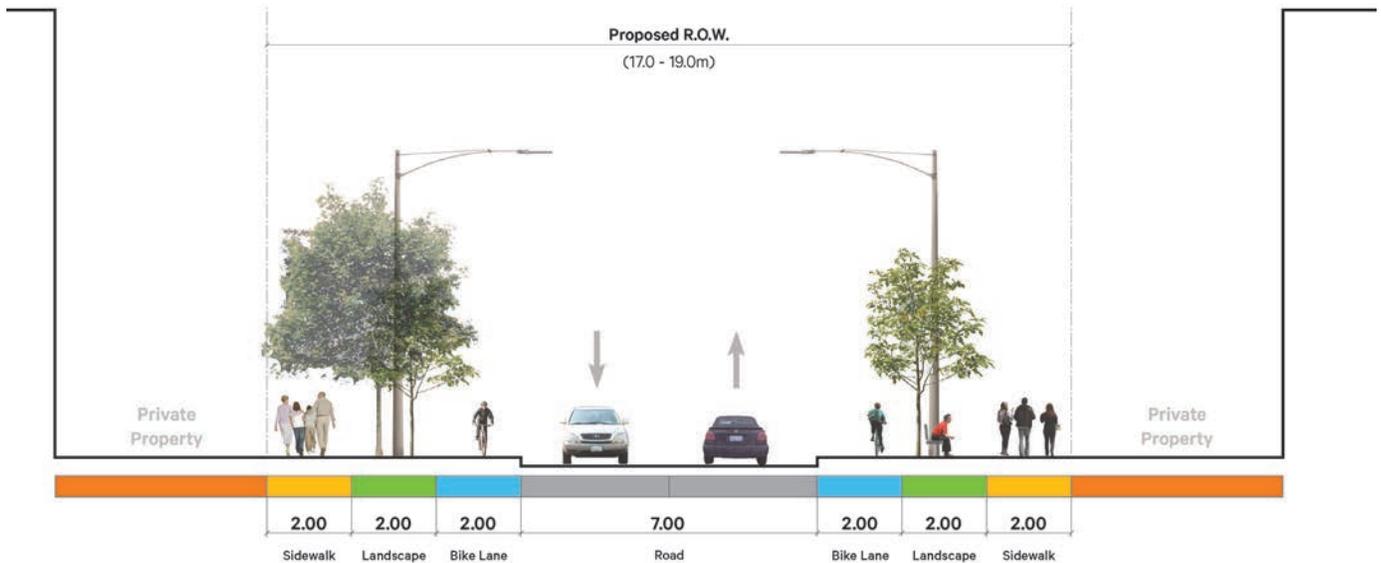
Whites Precinct Streetscape Cross Section - New East-West Public Streets
